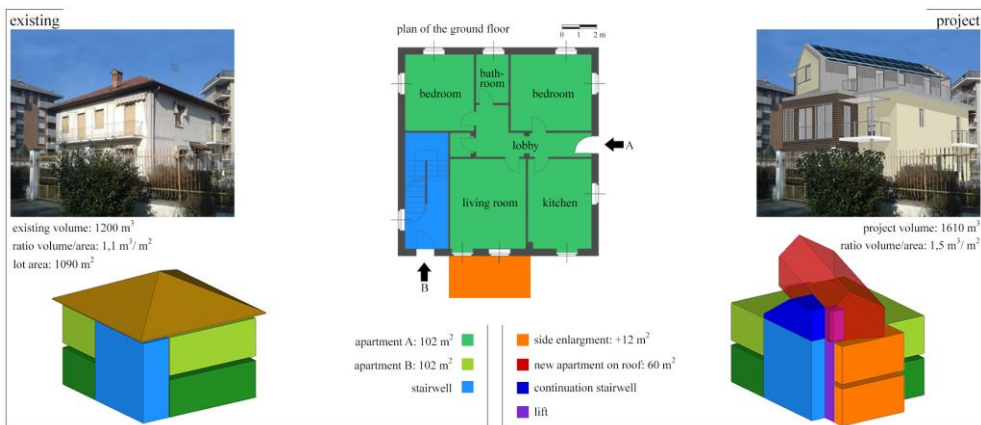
The residential building used as case-study: existing and project schemes (the second floor having the same layout of ground floor).
